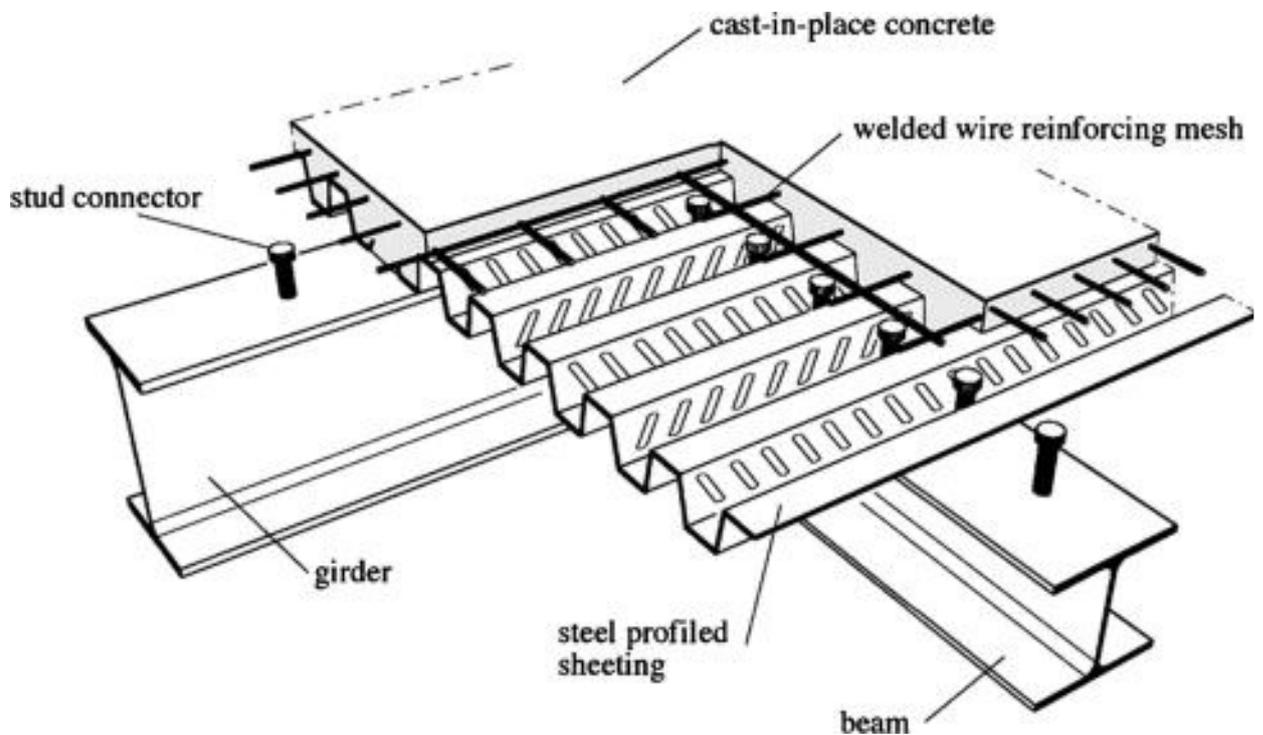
Detail of a monolithic reinforced concrete slab on steel beams
